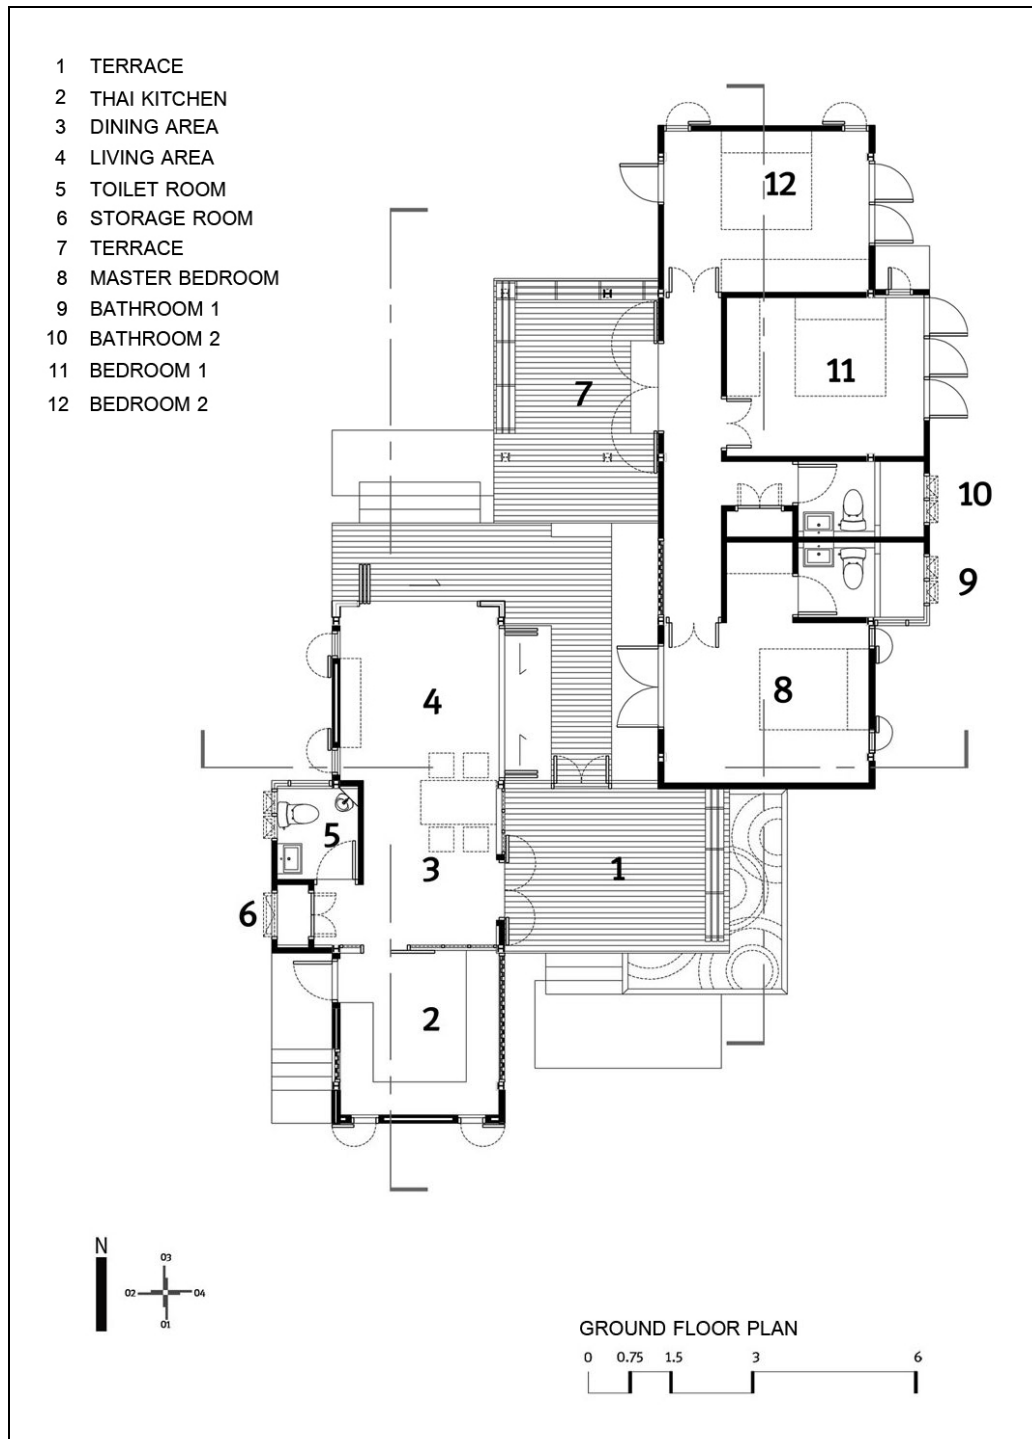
Plan :Clustered house separated public zone and private zone connected by terrace
